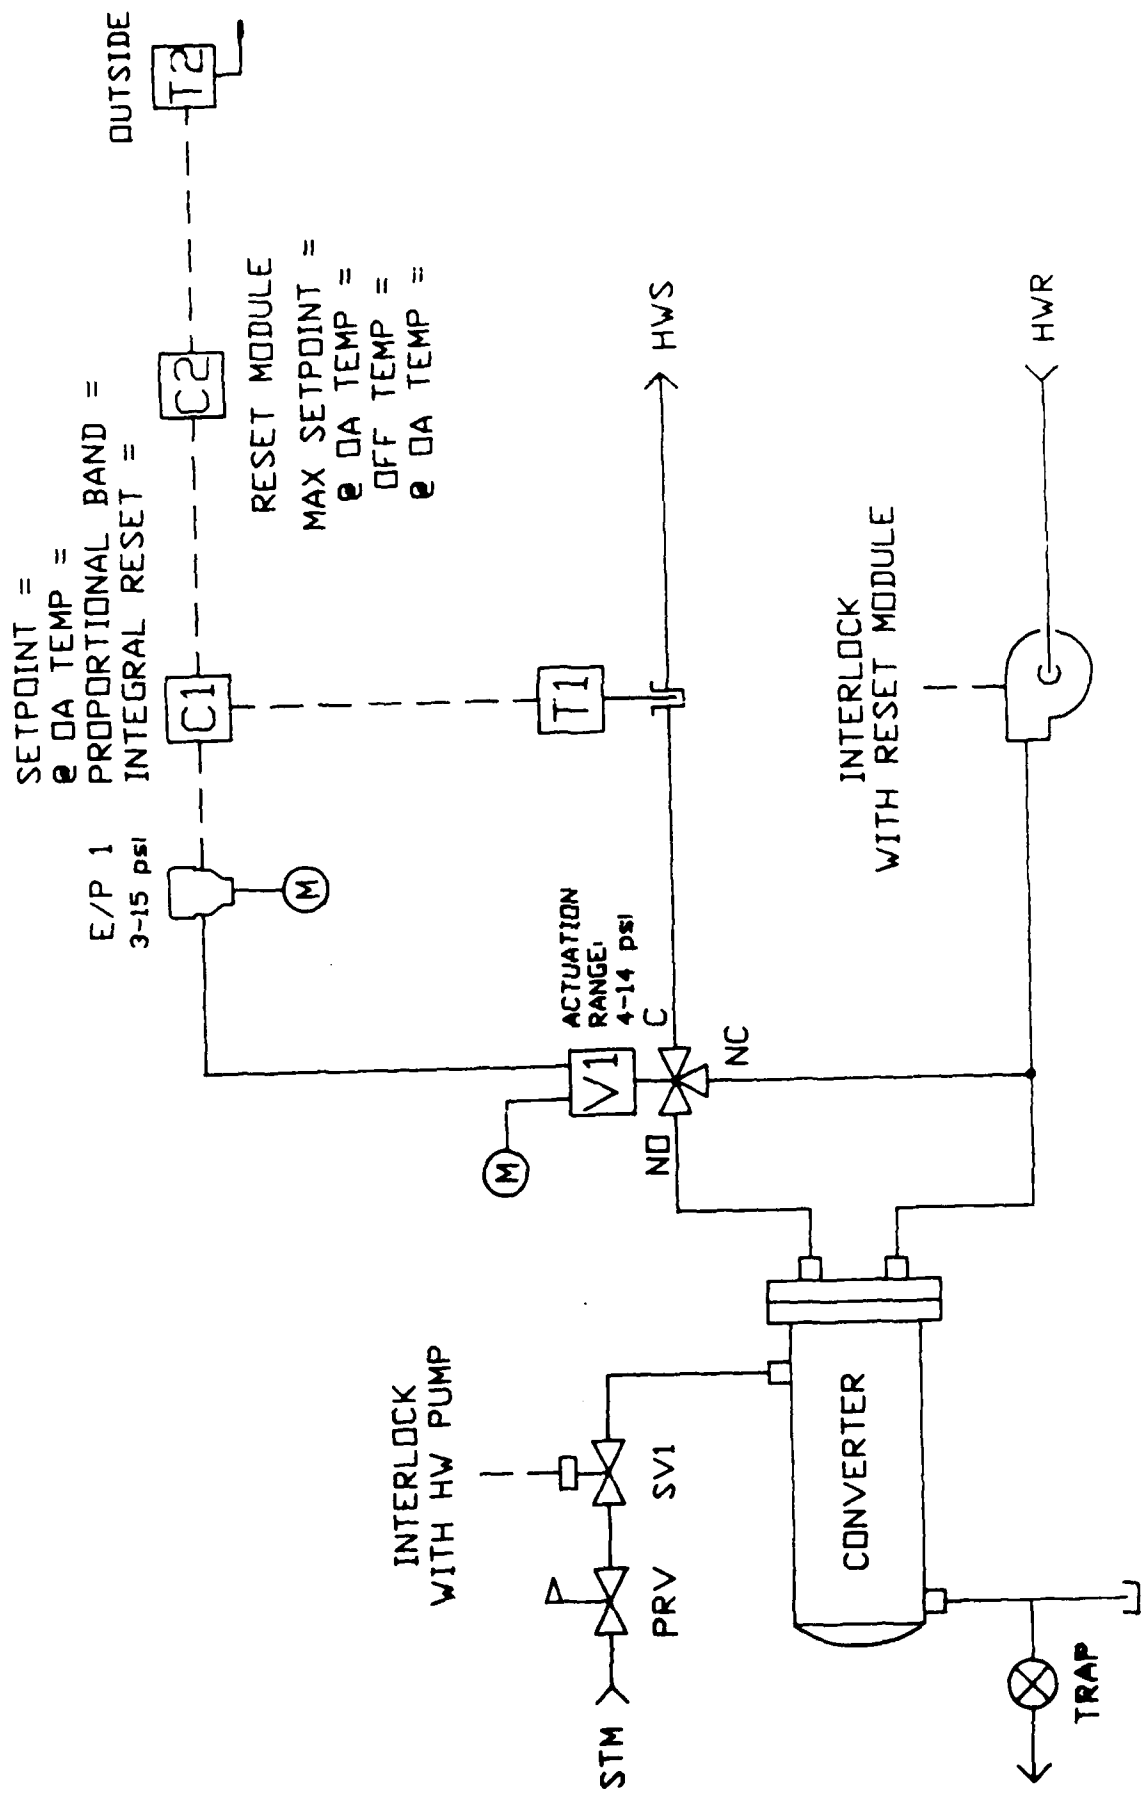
Steam to Hot Water Converter, Mixing Valve Control
